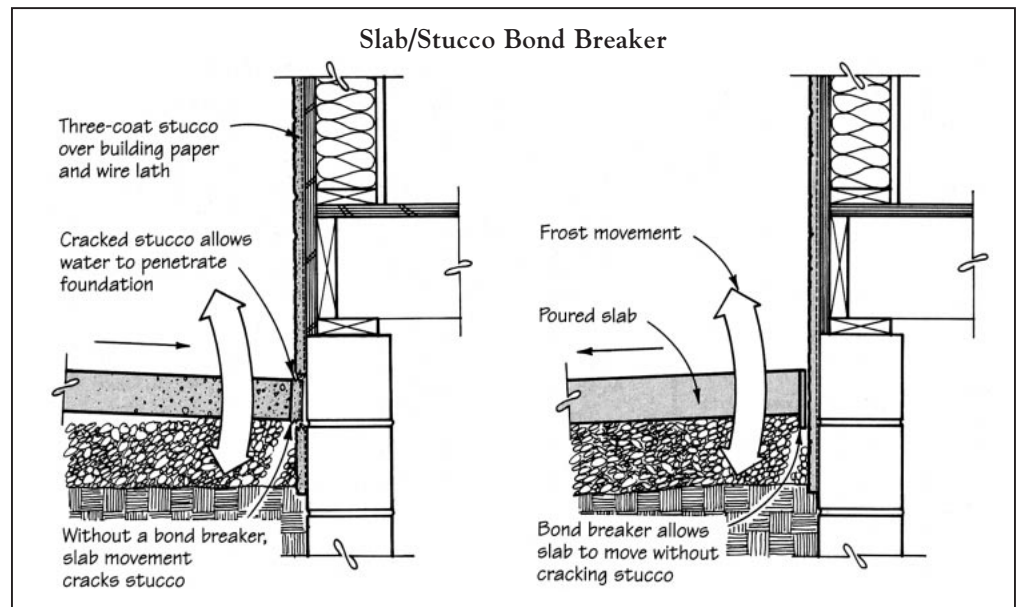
When a slab patio is poured so that it bonds to a stuccoed wall, the inevitable movement of the slab will crack the stucco (left), providing an entry point for water. Instead, use a bond breaker of rigid foam or fiber board, which allows the slab to move independently (right).
